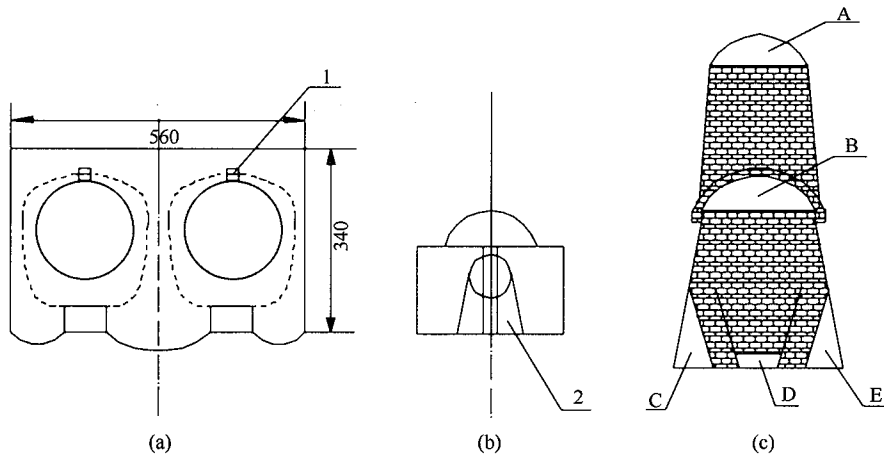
Diagrammatic Sketch of the Structure of a Typical Double Drick Kilns
